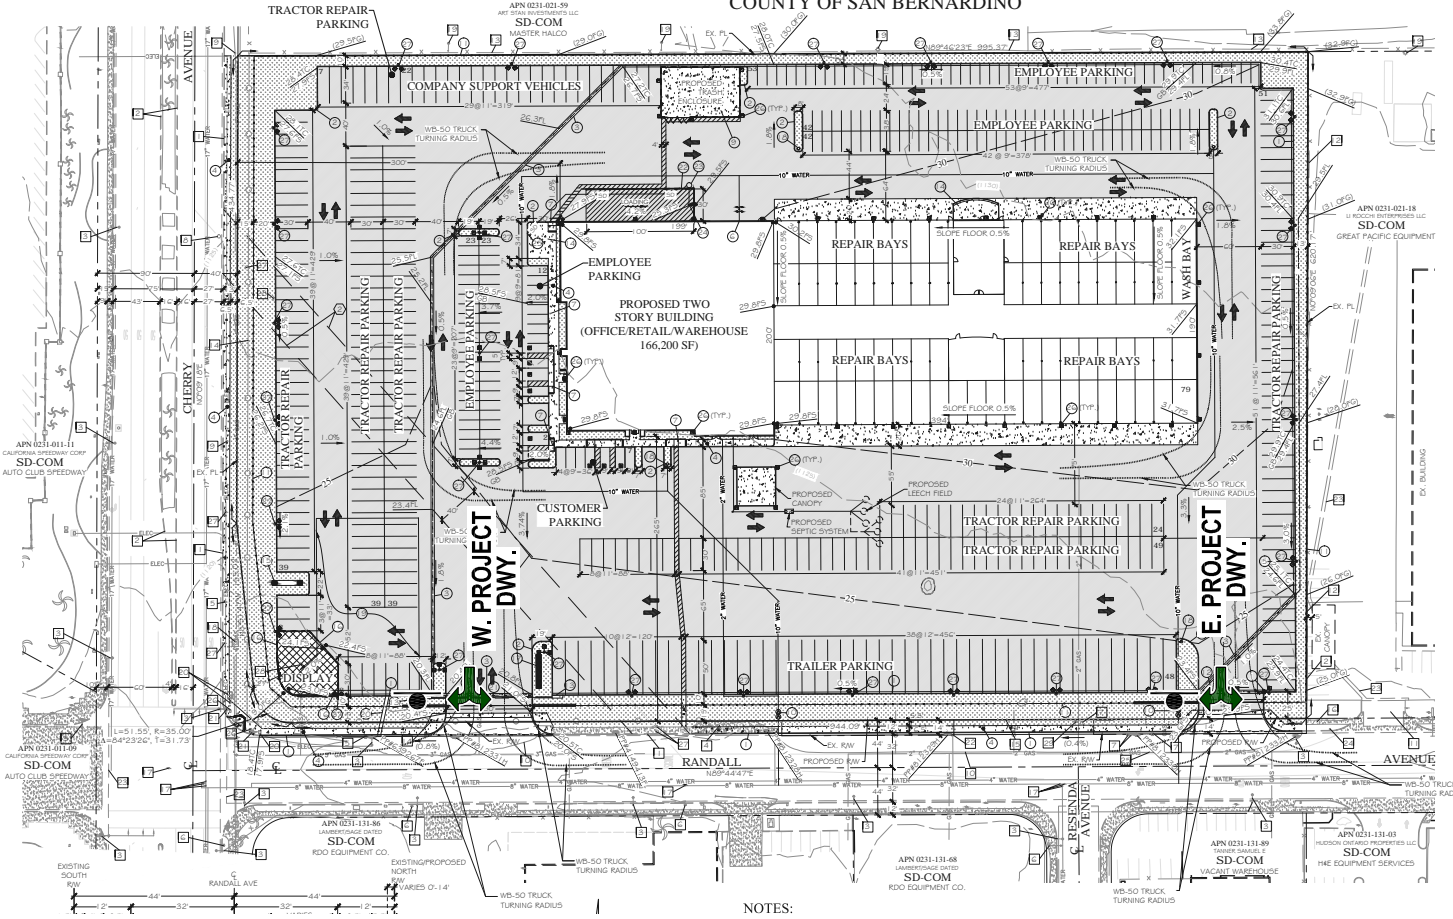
A illustrates the on-site recommended roadway and intersection lane improvements. Construction of on-site improvements shall occur in conjunction with adjacent project development activity or as needed for project access purposes.
